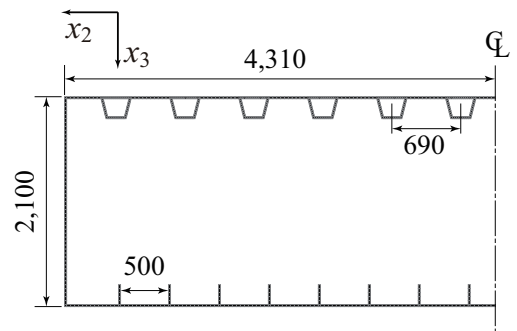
The cross section of the stiffened girder. (dimensions in mm)
